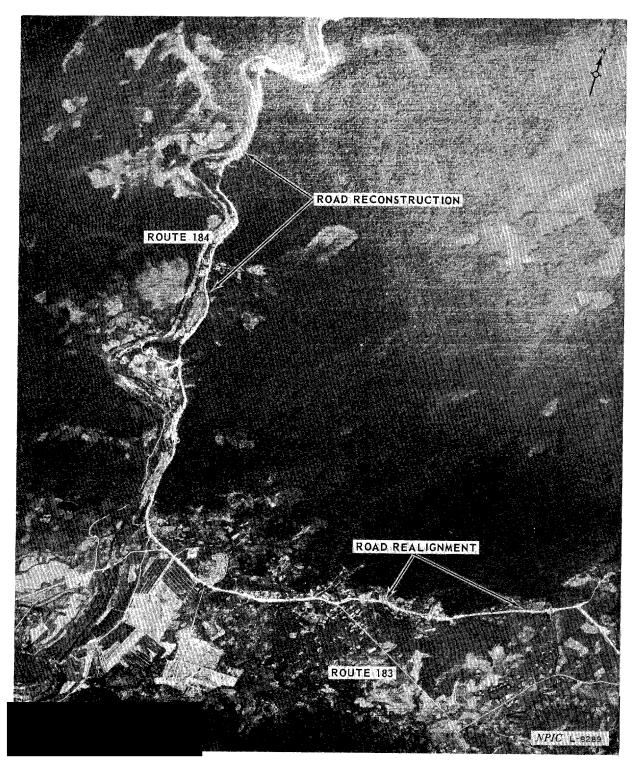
ROAD CONSTRUCTION, ROUTE 184 AREA, NORTH VIETNAM
